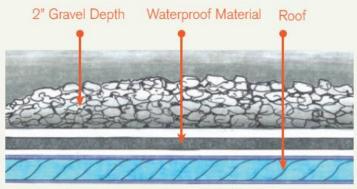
Typical Blue Roof Tray Section (Source: www.arcsa-edu.org)
